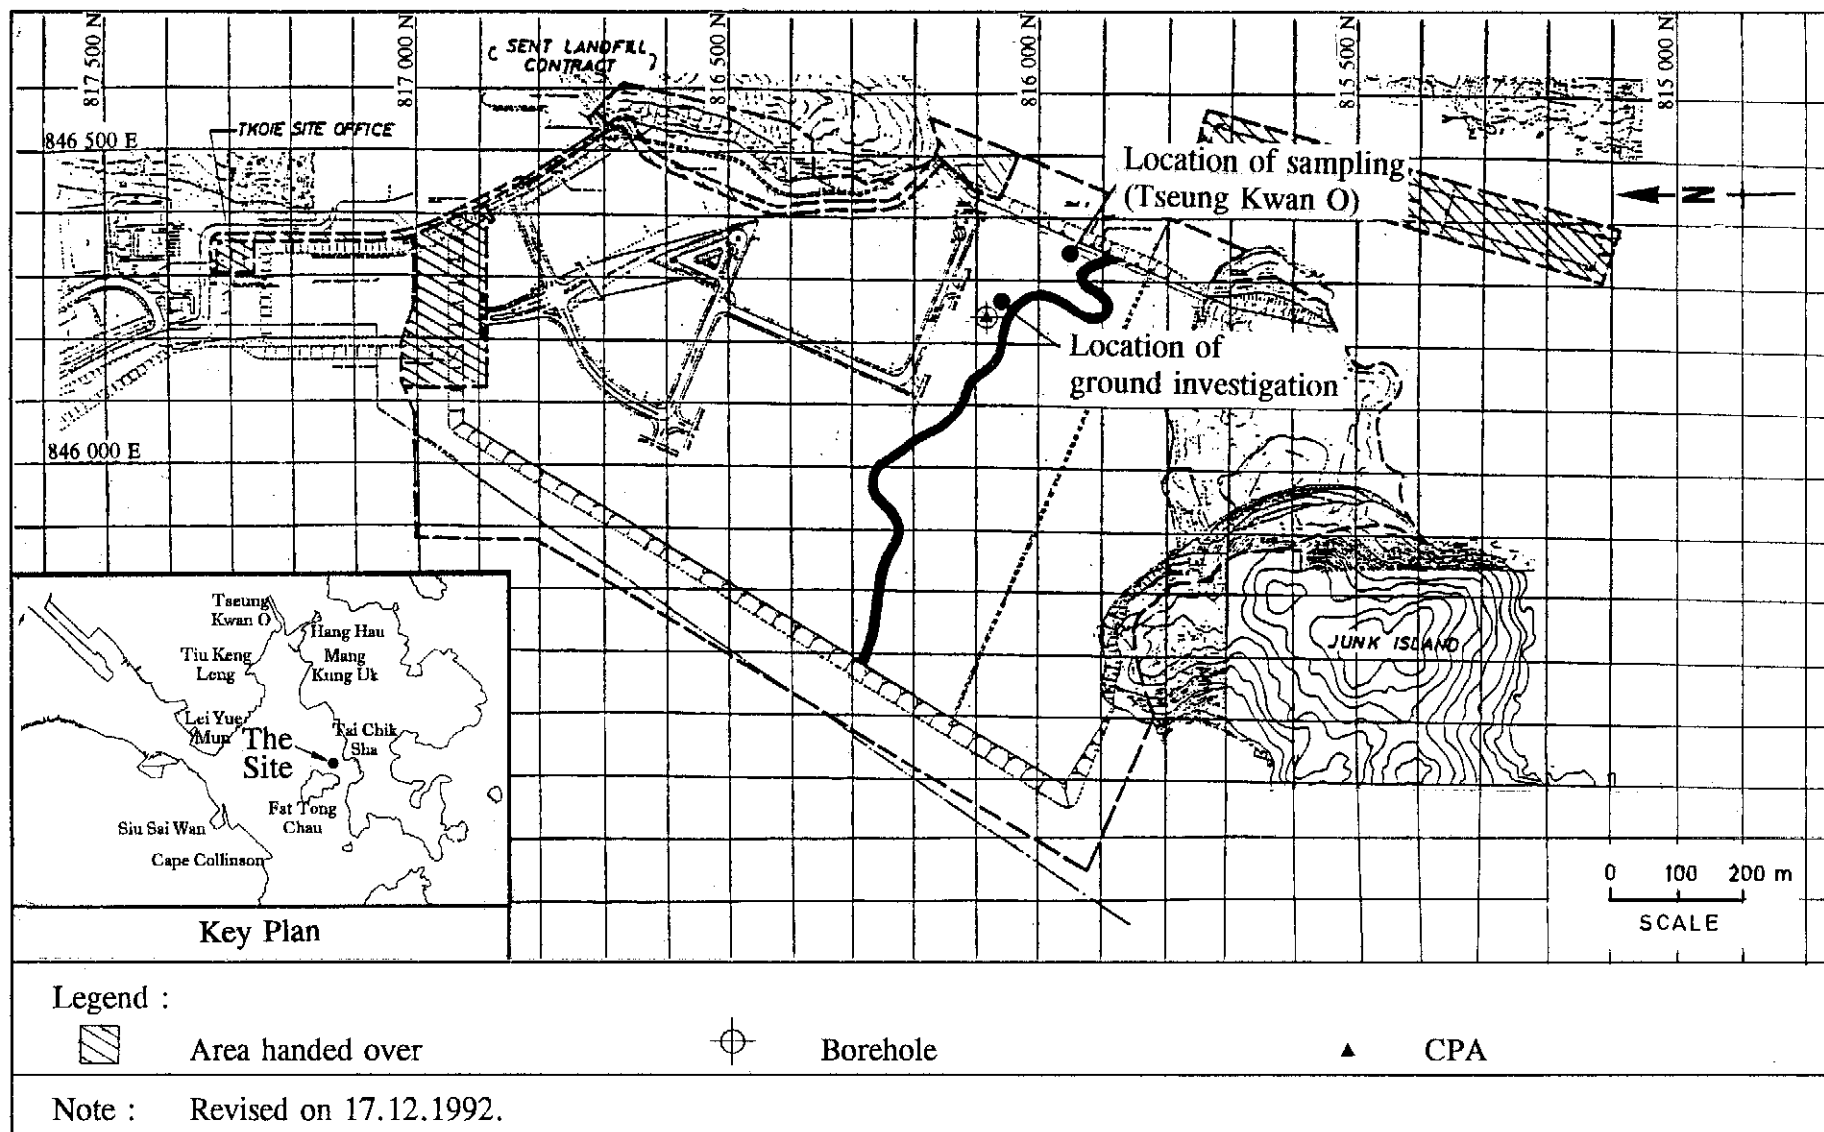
Site Location Plan (Tseung Kwan O Industrial Estate Reclamation)
